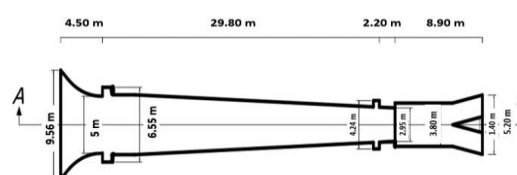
Plan of No. (1) Seymareh Dam's bottom outlet
